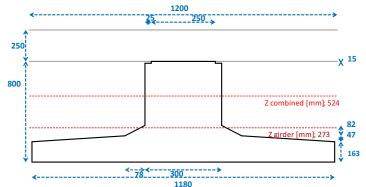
Cross-section of HRP 800 girder from Haitsma.
